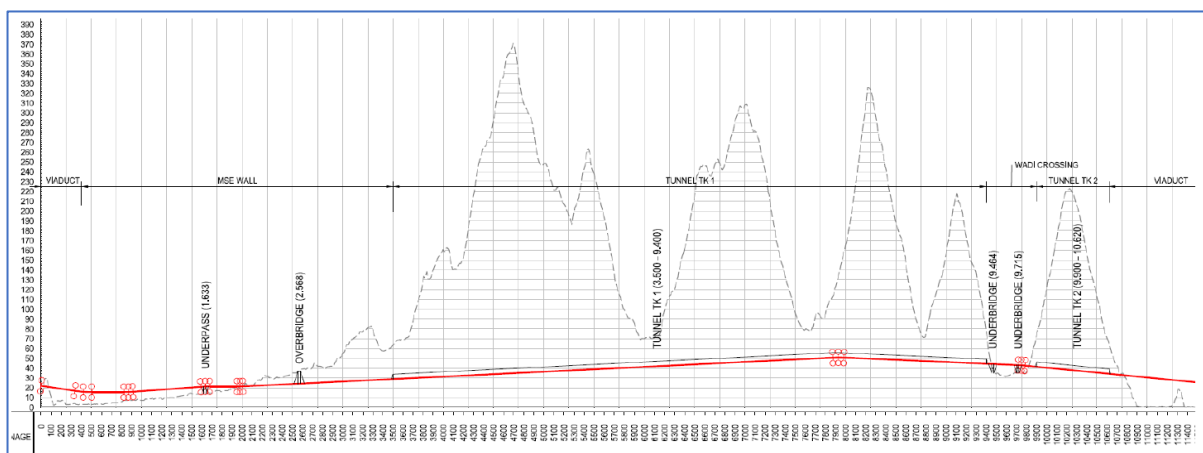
Layout of Khor Fakkan Tunnel (KFK).
